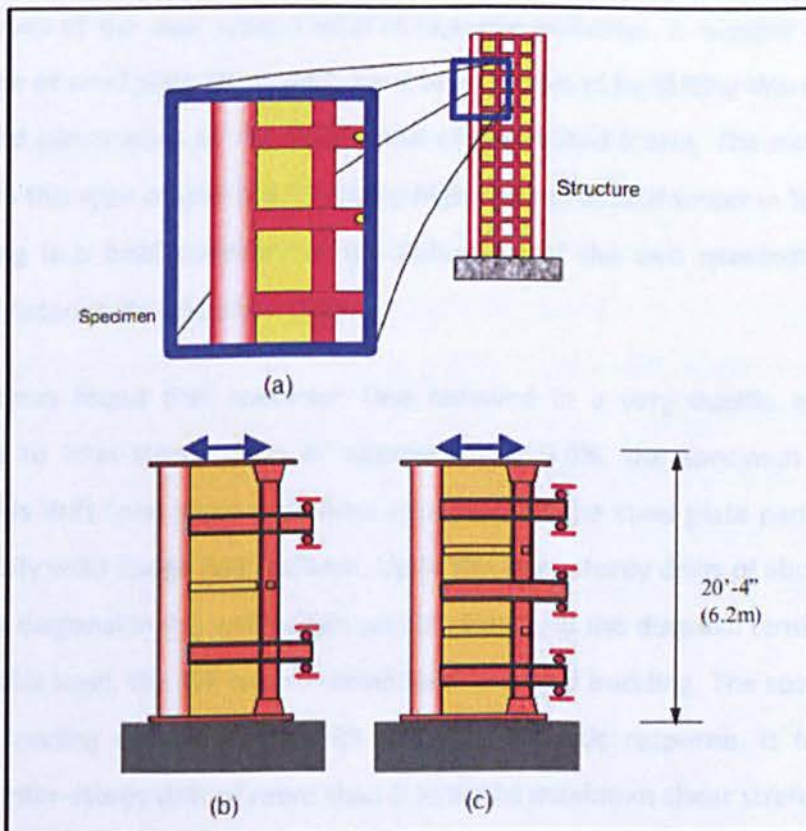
Scheme for (a) location of specimens (b) Test specimen One (c) test specimen Two (Astaneh-Asl., 2000)
